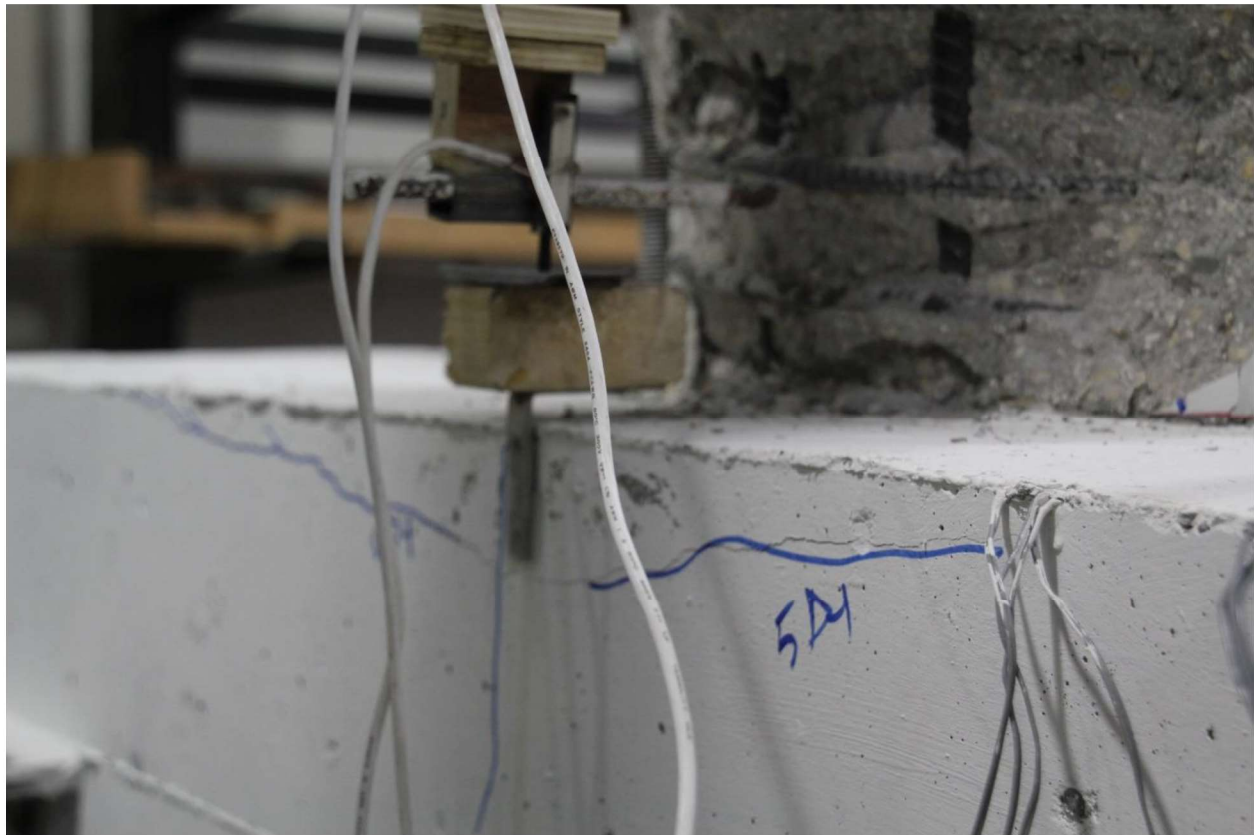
Cap-beam cover spalling at  $5\Delta_y$  (south of the column).
